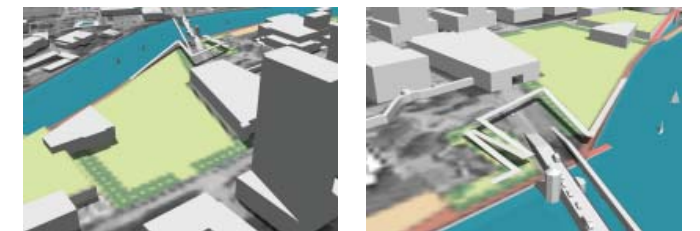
Option 3 – Cass/CSX Bridge: over bridge switchback ramp system.
